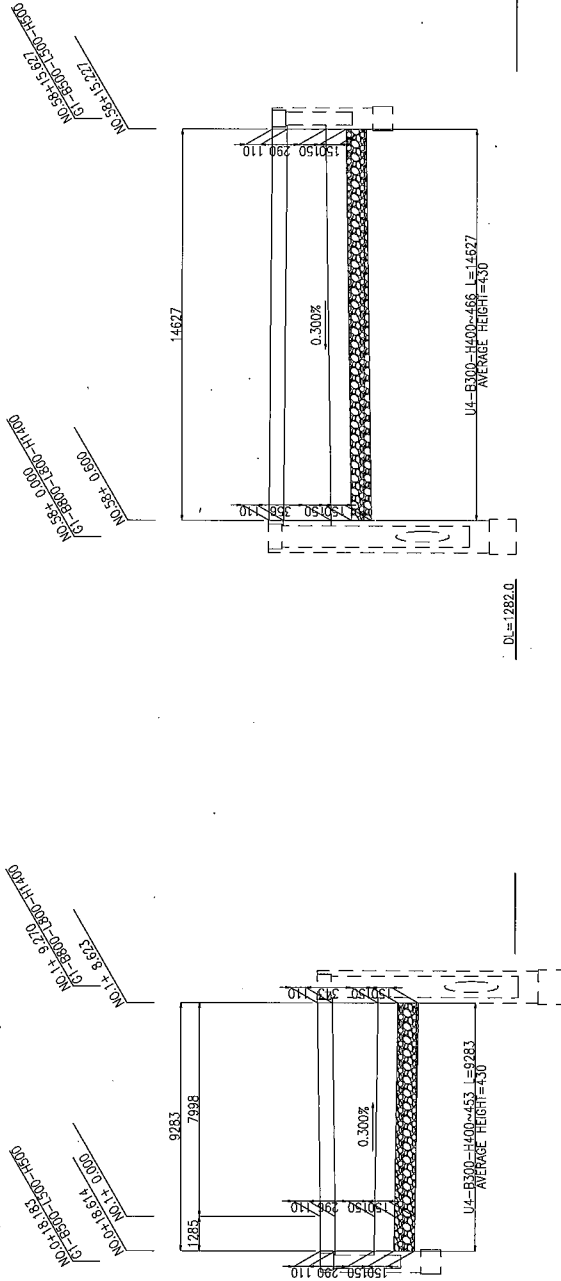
DETAIL OF OF DRAINAGE STRUCTURE (2/2)
